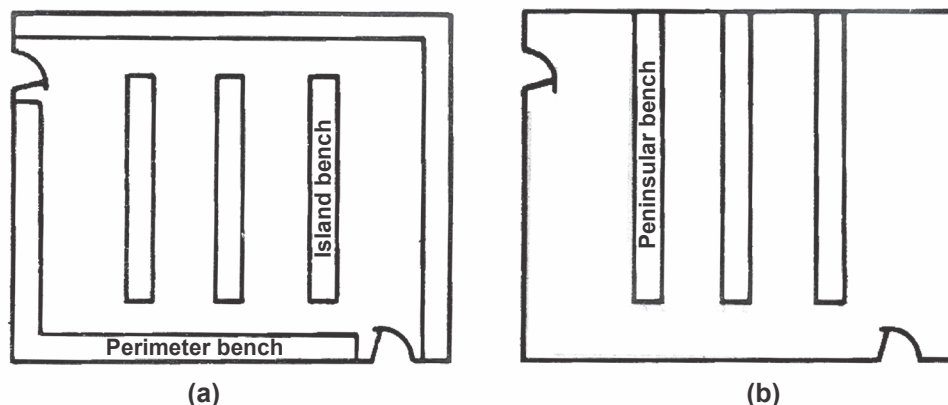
Possible of benching layouts in a school or college lab: a) Perimeter and island benching; b) Peninsular benching.
